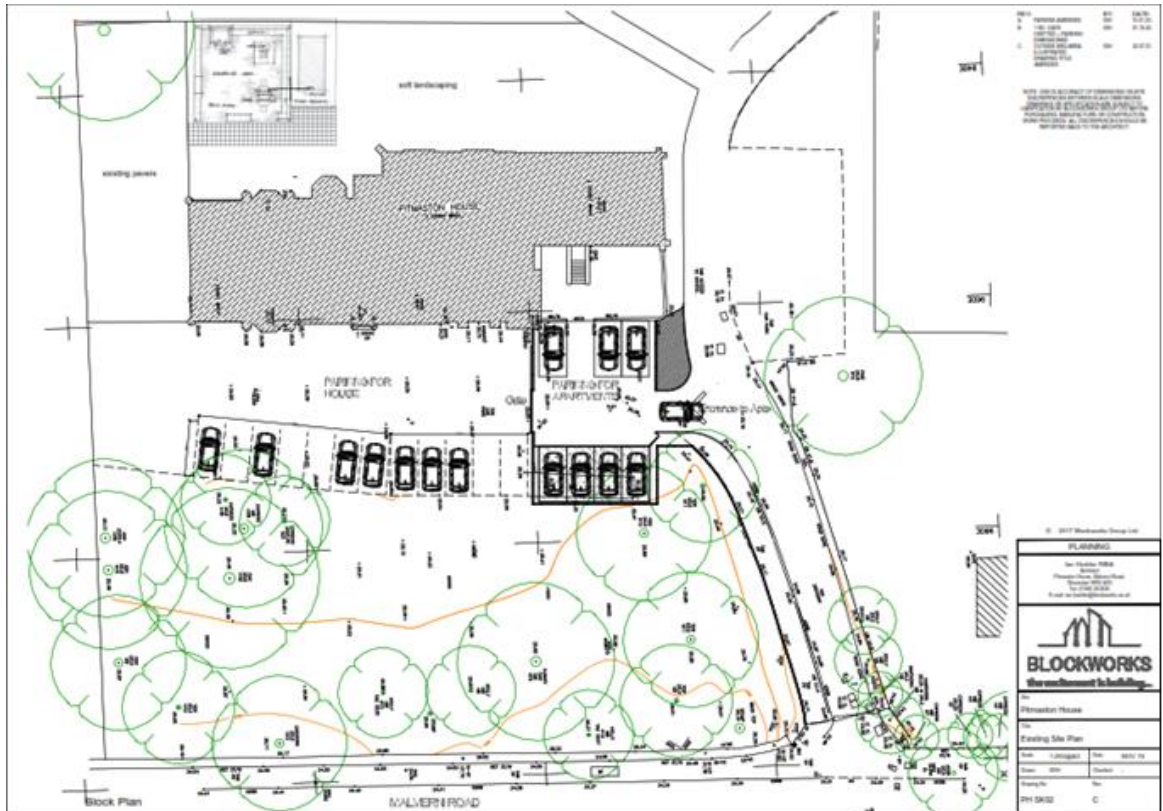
Existing Site Block Plan (Drawing No: PH SK02 Rev: C)
